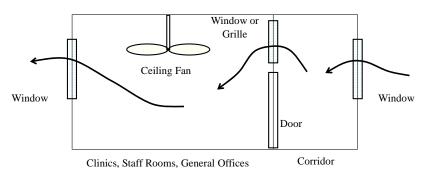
Ventilation System for Consulting Room, Staff Room, General Office
